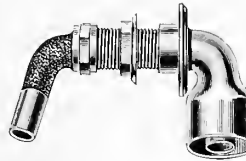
URINAL INLET CONNECTION, WITH BENT COUPLING.
